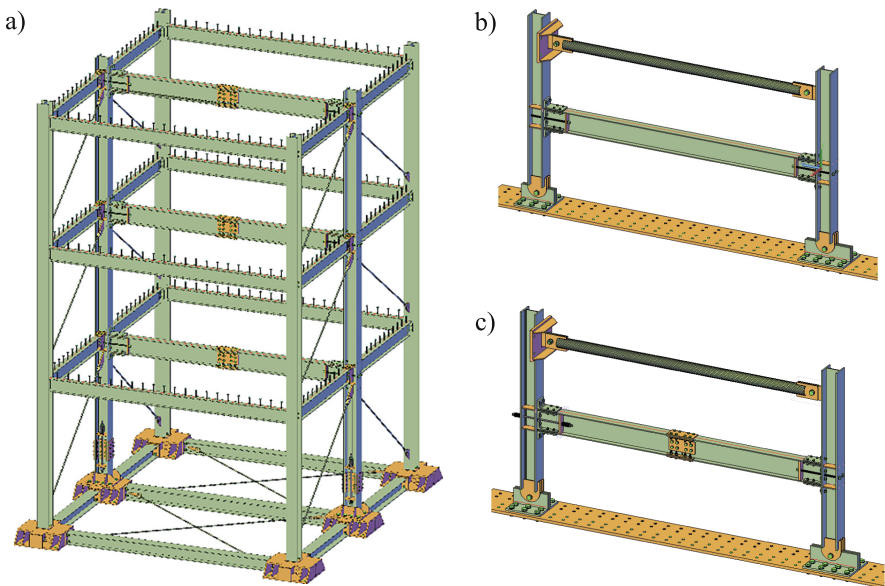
a) 3D Large-Scale Test Specimen; b) and c) Test Sub-assemblies.
